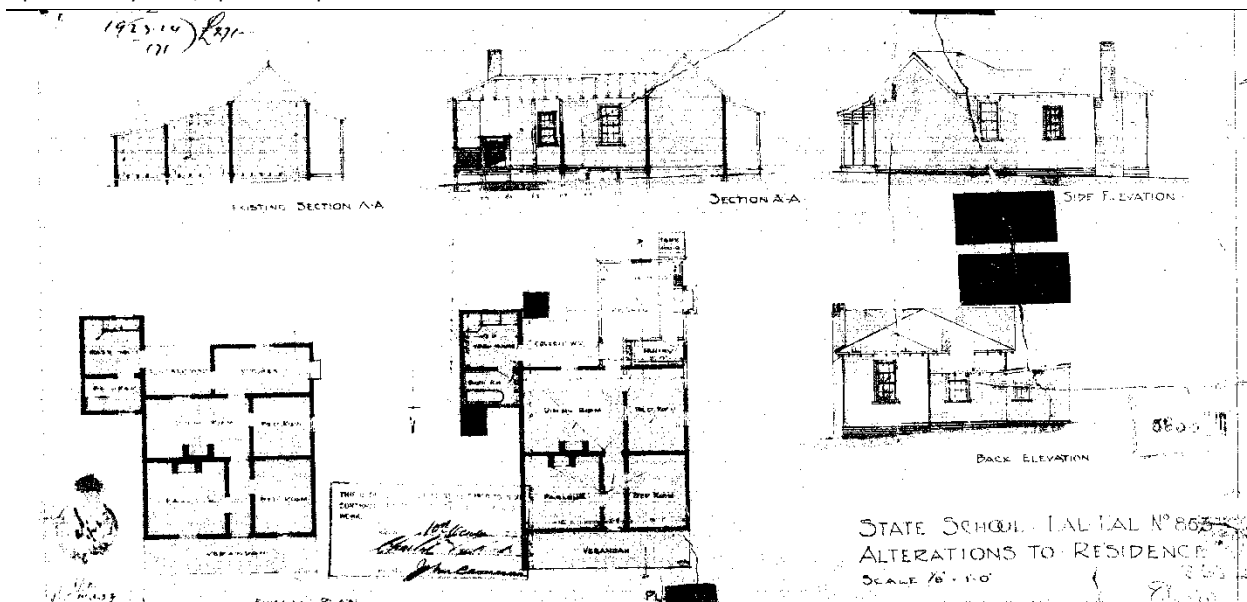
Drawing of Additions to the Lal Lal School Teacher's Residence, 1924.
